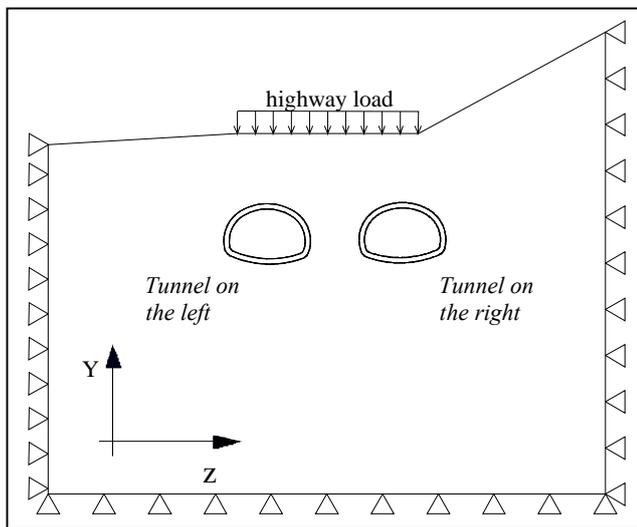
FIGURE III. TYPICAL CROSS SECTION VIEW OF THE TWIN TUNNELS CONSTRUCTED UNDERNEATH THE HIGHWAY.
